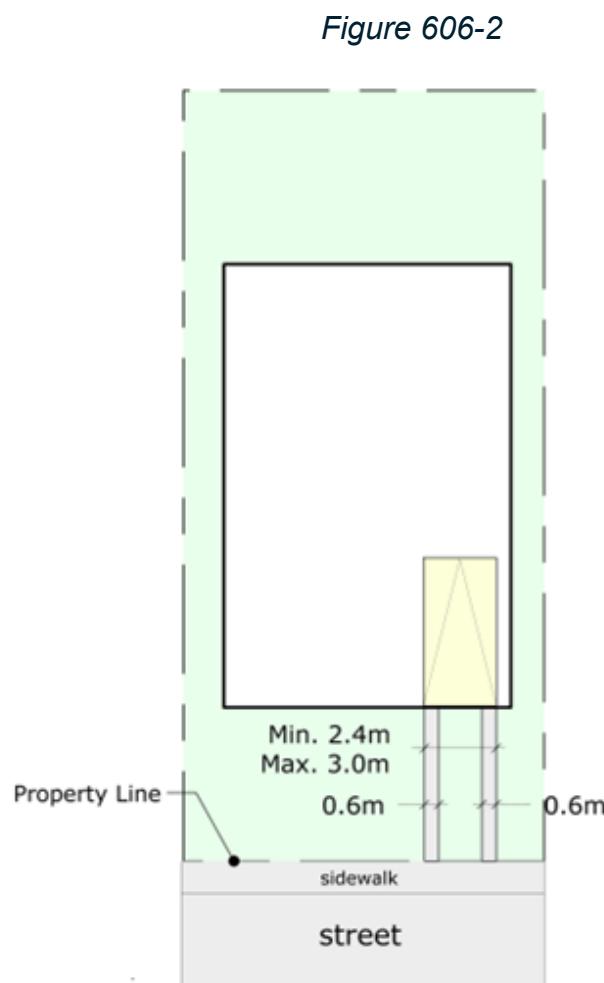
illustrates the maximum wheel strip width and maximum total driveway width of a wheel strip driveway. The space between wheel strips must be comprised of permeable material.
